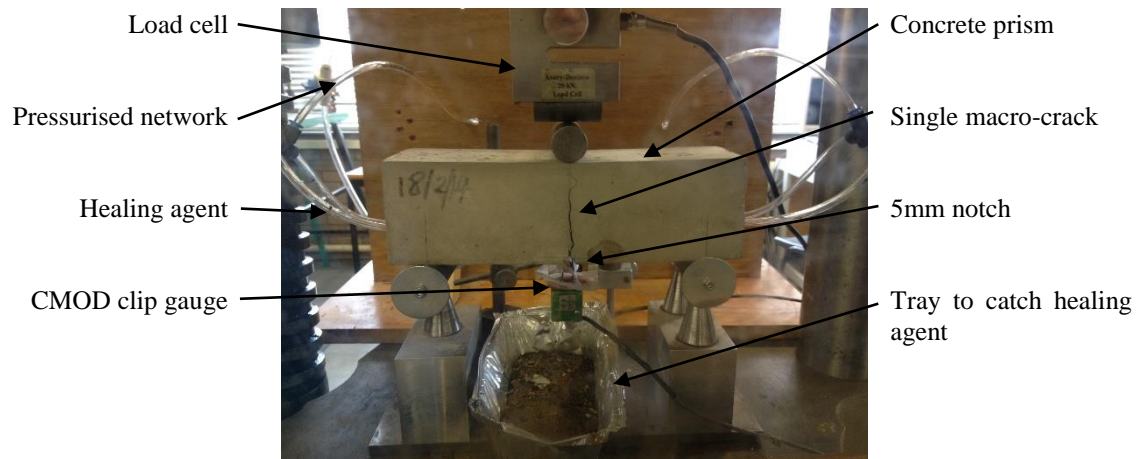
Example loading setup concrete prism for pressurised 1D twin network
